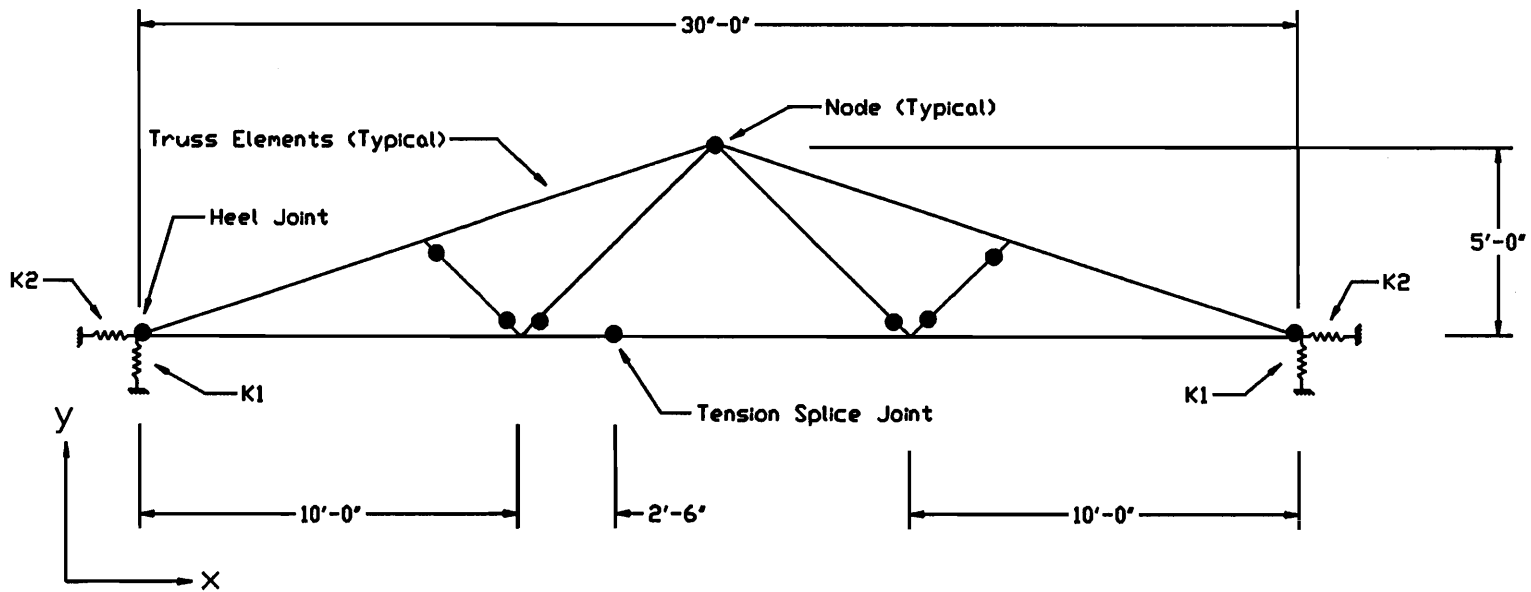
Finite element model of a typical metal-plate-connected truss
